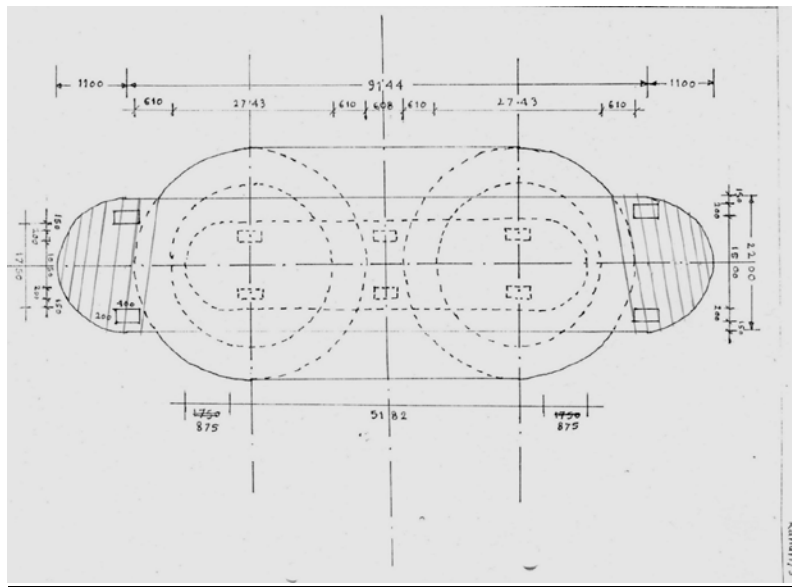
Bridge on Mula river at Rahuri Hatched portion shows widening work
